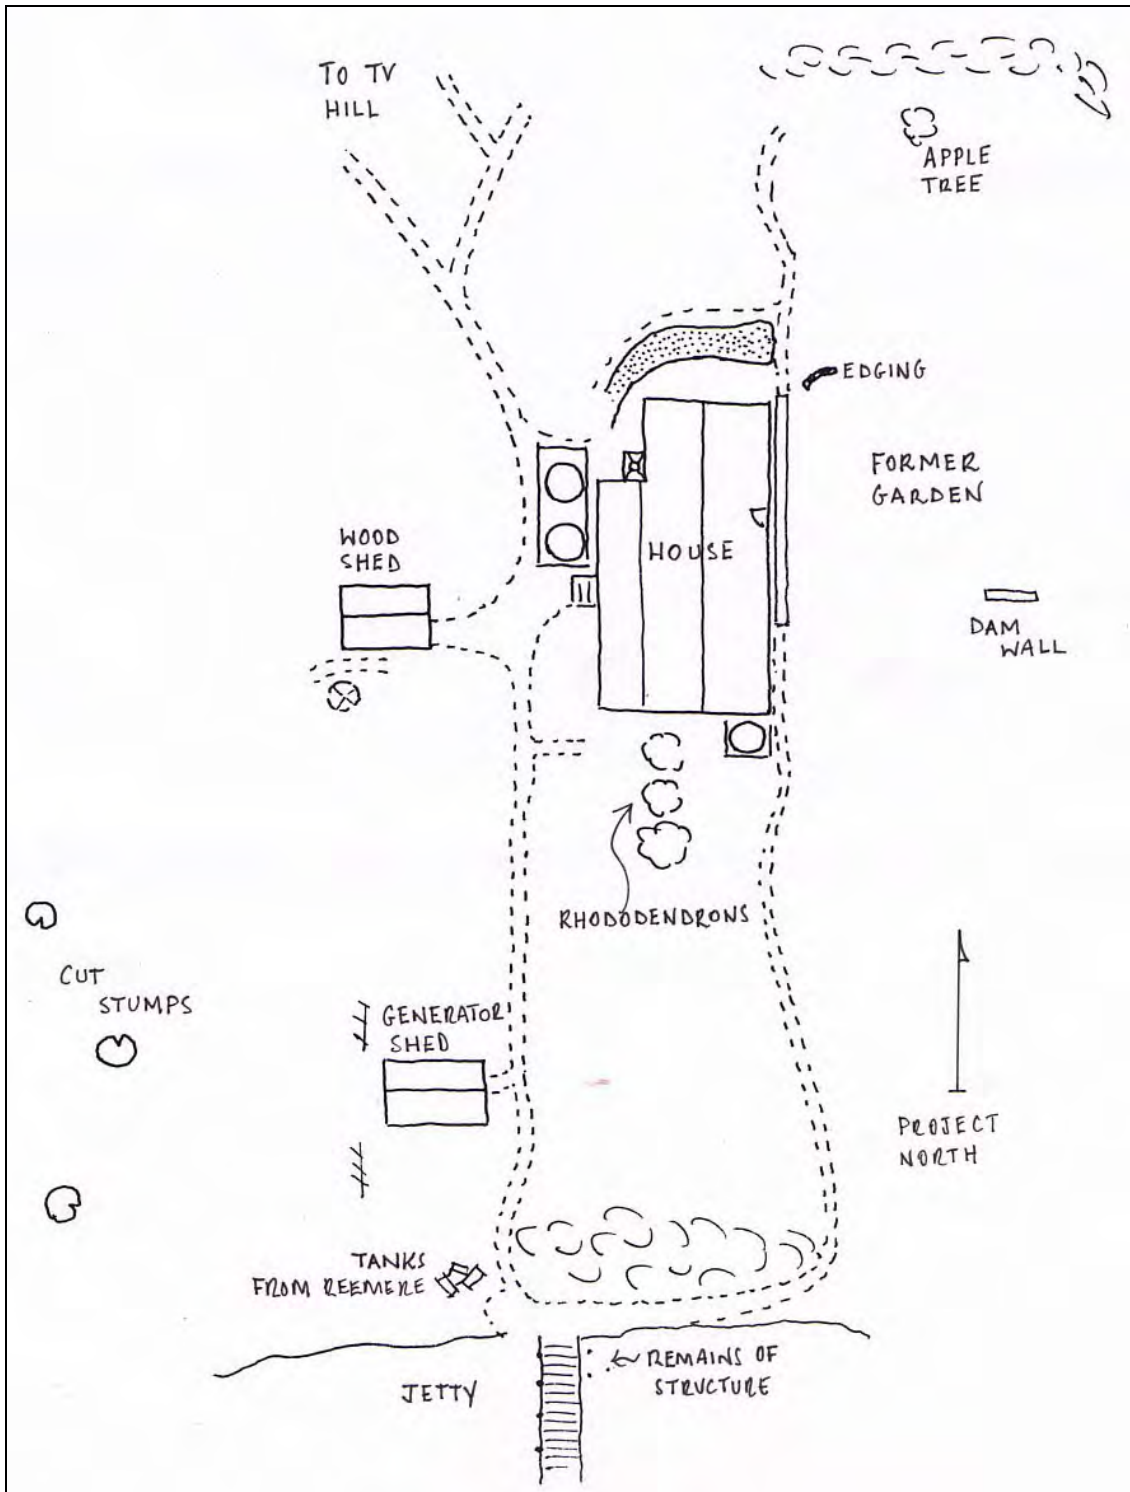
Sketch plan of features comprising the Clayton's House complex (n.t.s).
